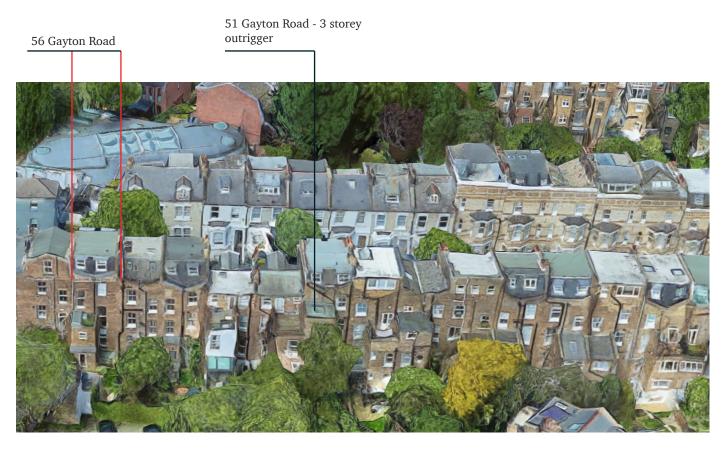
Aerial Map of rear elevations of Gayton Road
